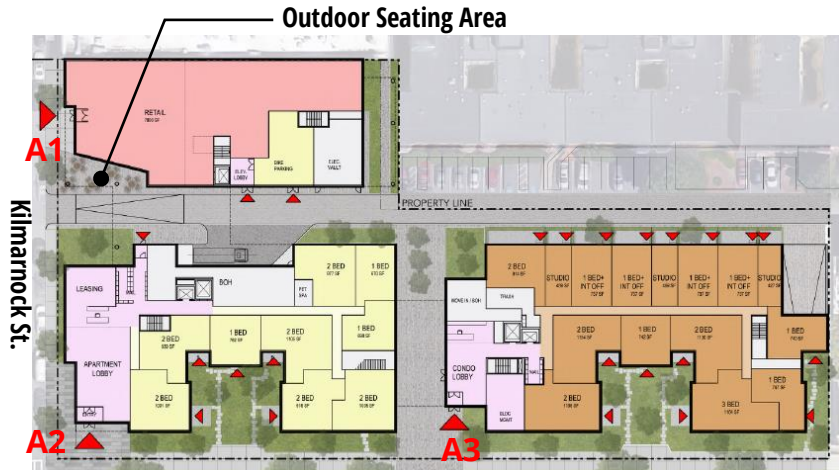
Ground Floor Plan of Buildings 1 and 2 (Top) and Building 3 (Bottom)
